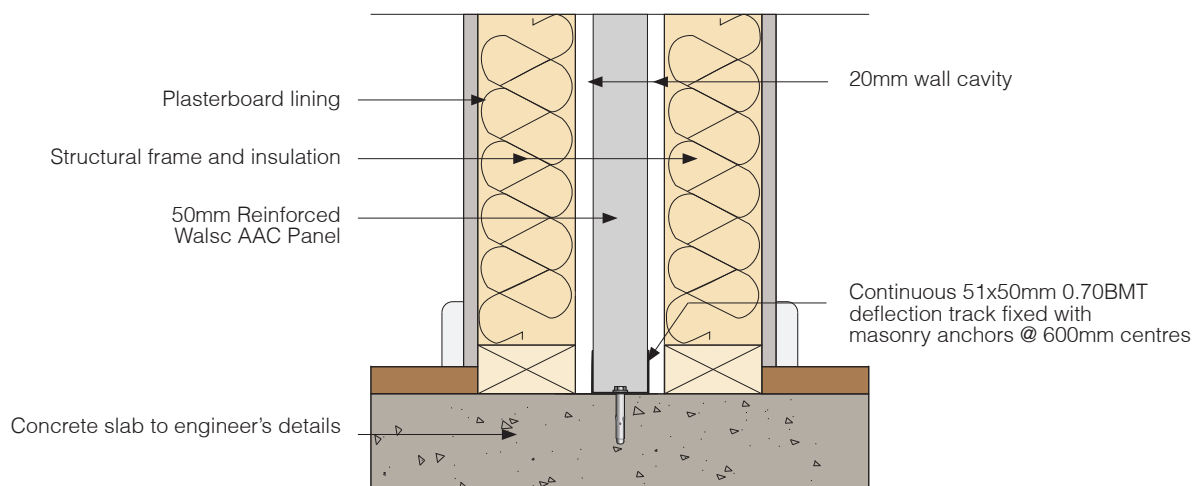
Vertically Aligned System Base of Wall Detail - Option 3
